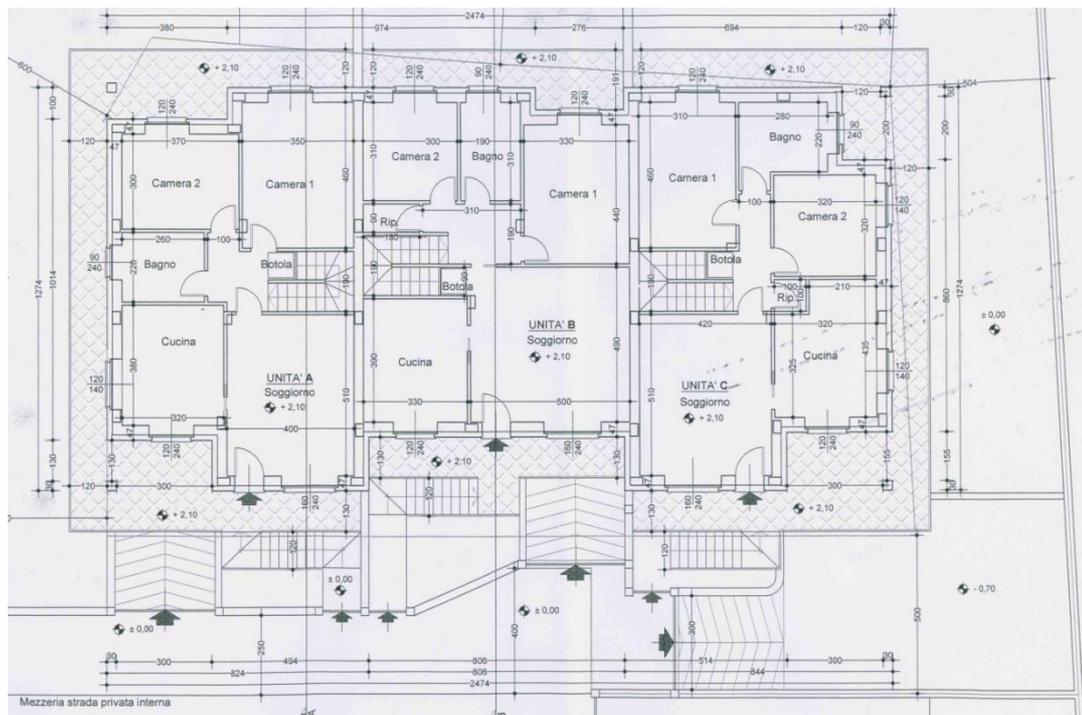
Ground Floor Plan (Via Mehlab 1C)
